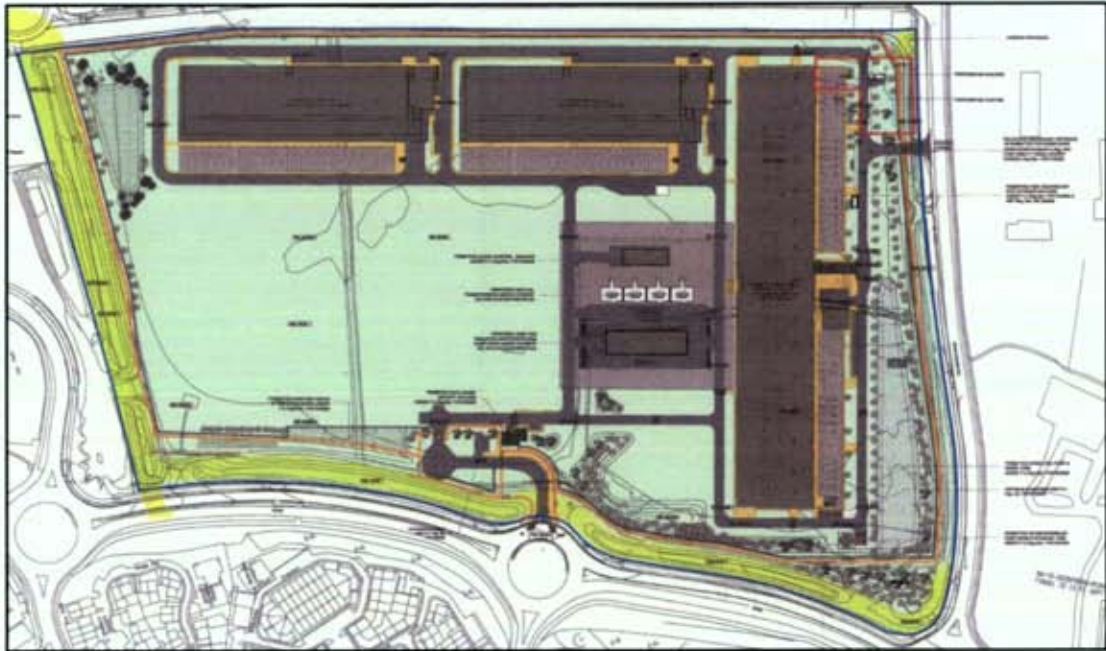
Extract from the site layout plan of the permitted MV substation application
